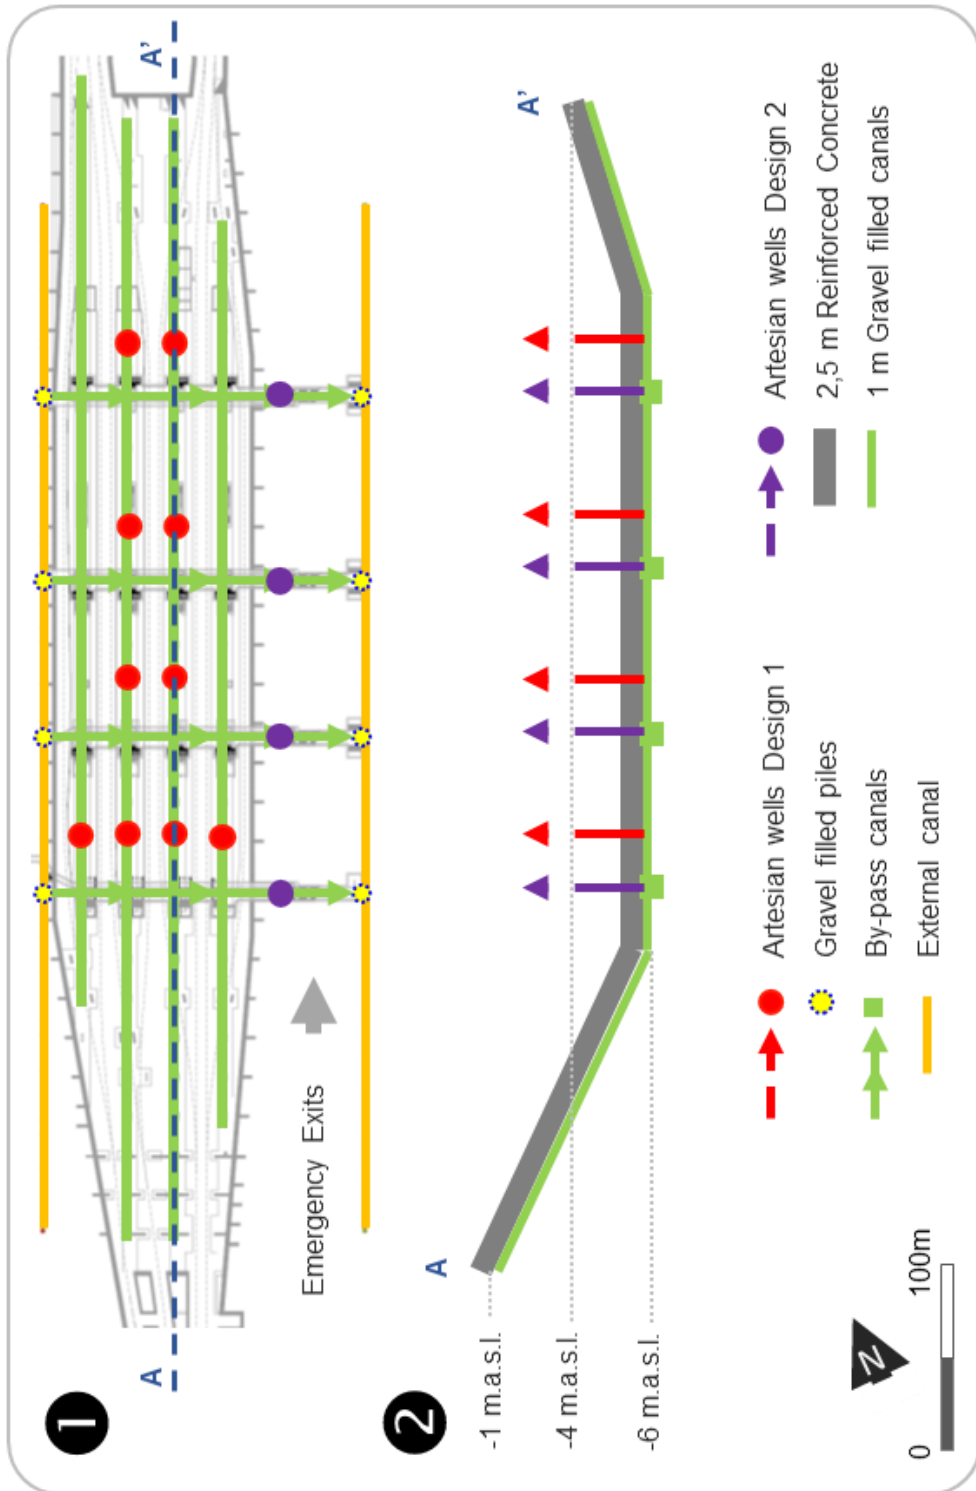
Integrated designs scheme. (1) Plan view. (2) Cross section.
